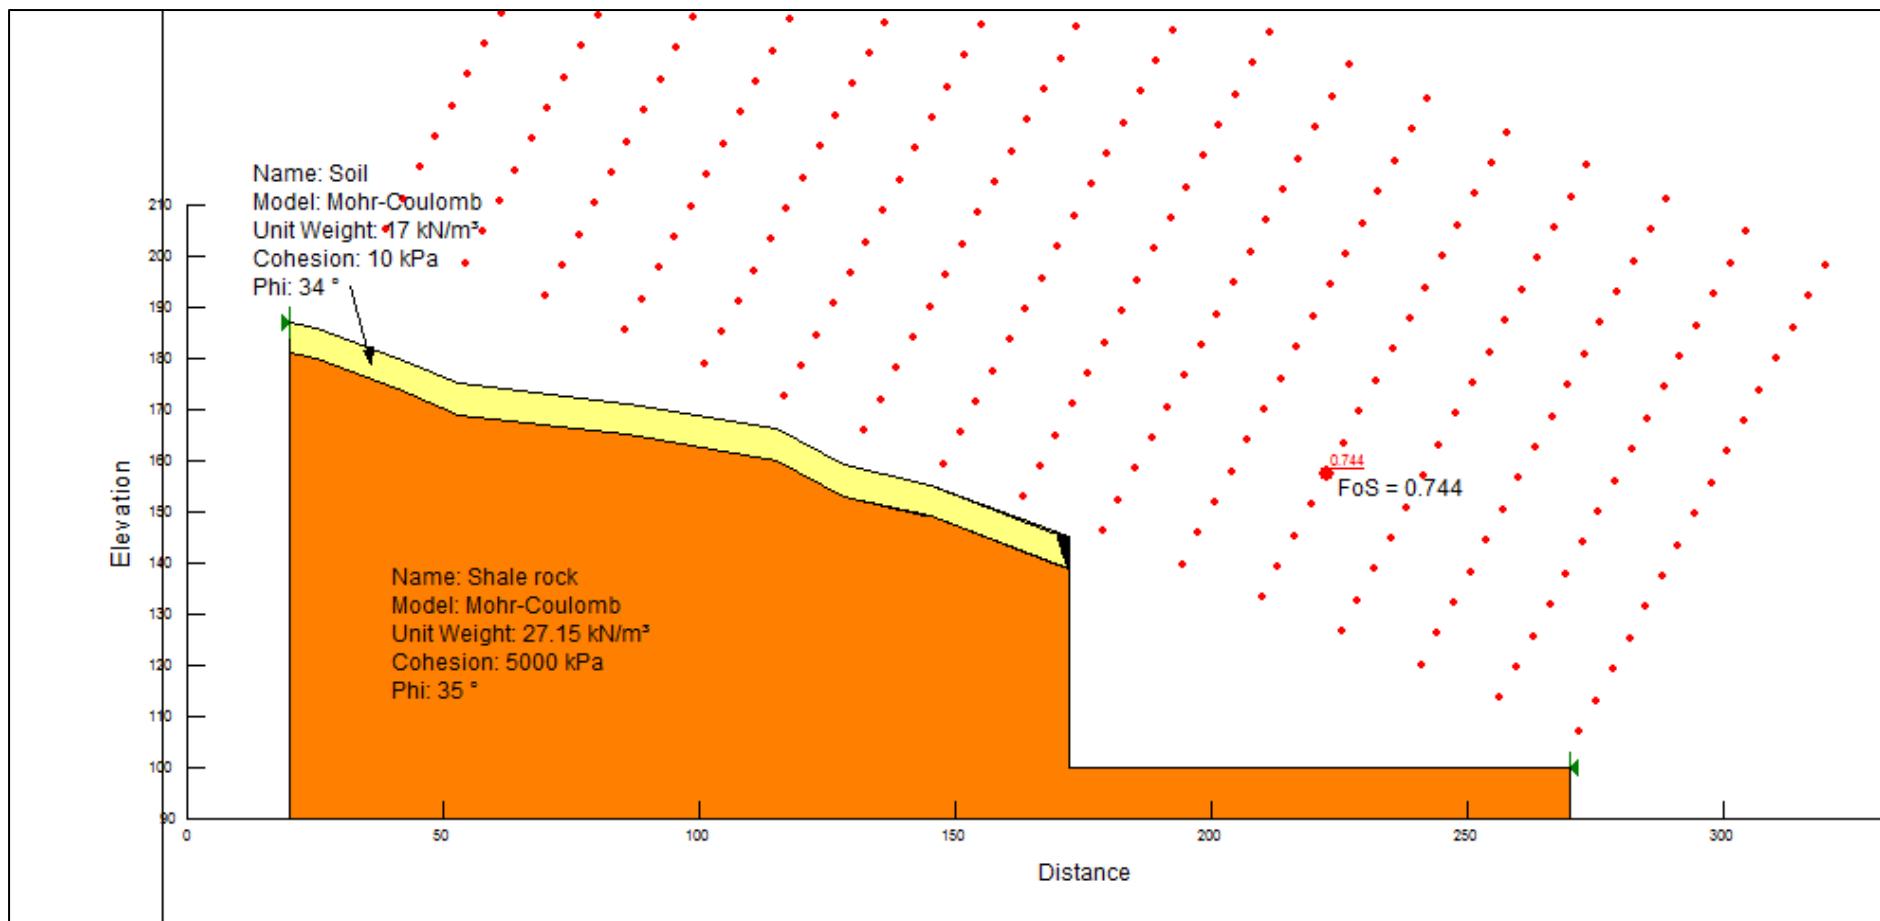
E.14: Outlet portal, Section 1, 90° excavation
